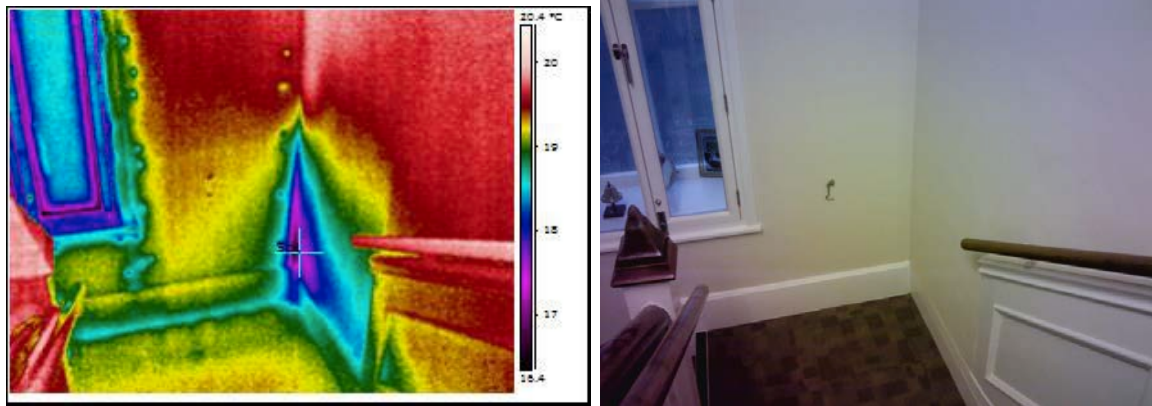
Staircase hallway. The image shows the thermal bridge at the junction of internal wall and external wall.
